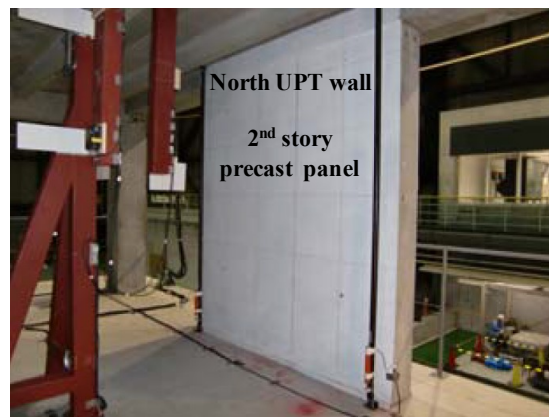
Instrumentation of 2nd story wall panel of north UPT wall
